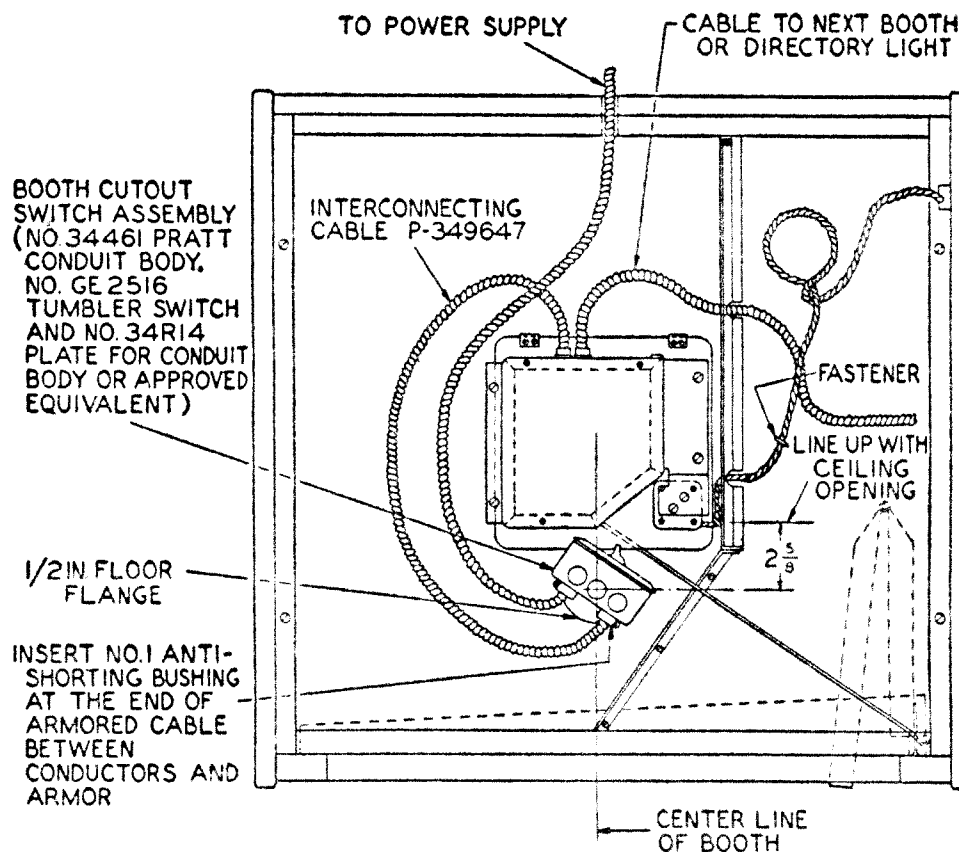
Typical Cutout Switch Installation with 4-Type Light Fixture
